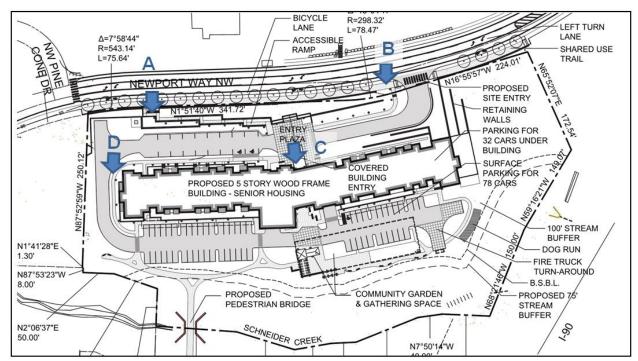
Pedestrian Connections to Break the Block Length Existing and New Circulation Facilities (6.2.B)
